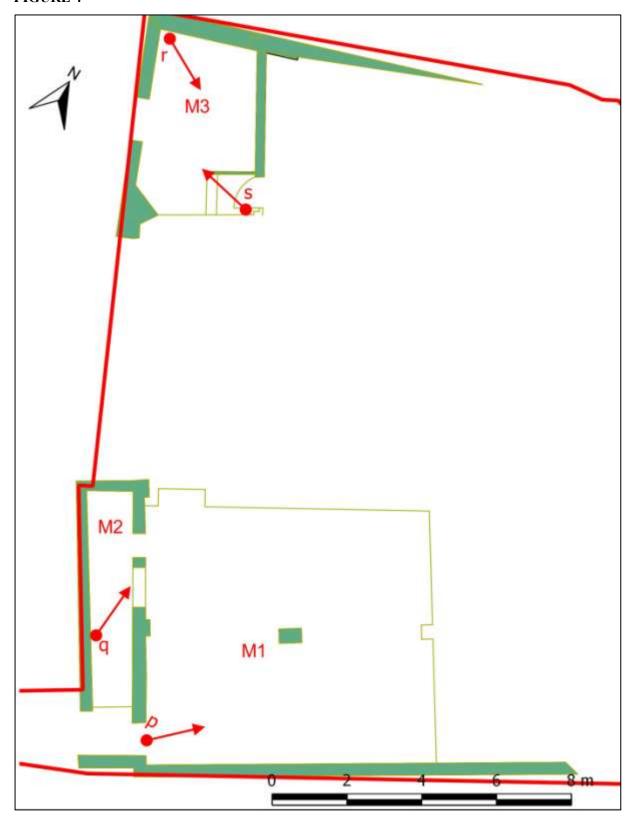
Mezzanine floor of the study area, after plans supplied by Wellesley Project Management Ltd. Approximate scale 1:100 at A4.
